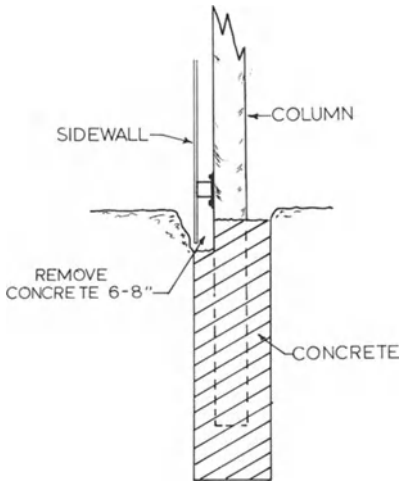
Cut to be made in setting concrete on exterior sides of columns, so side walls can extend neatly into the ground
